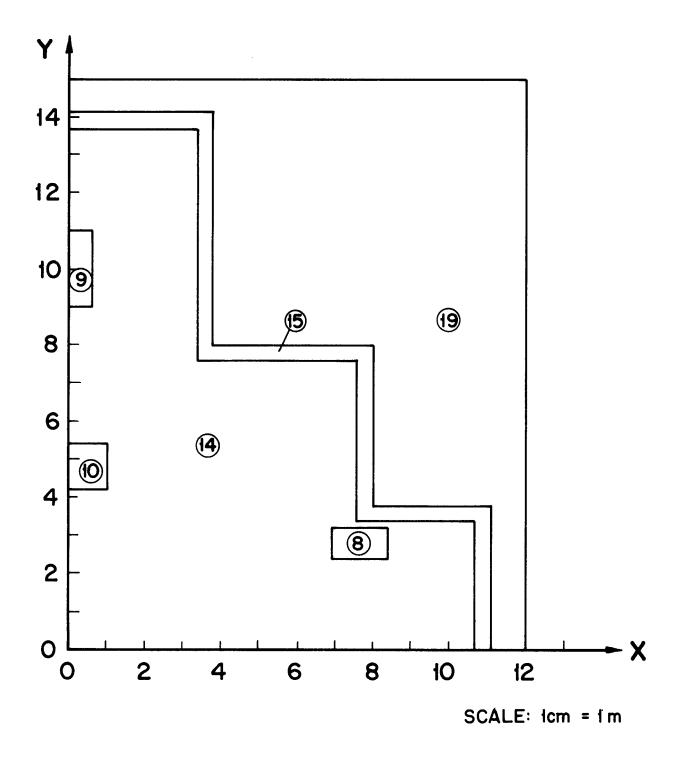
Horizontal cross section at 2.3 m above basement floor.
